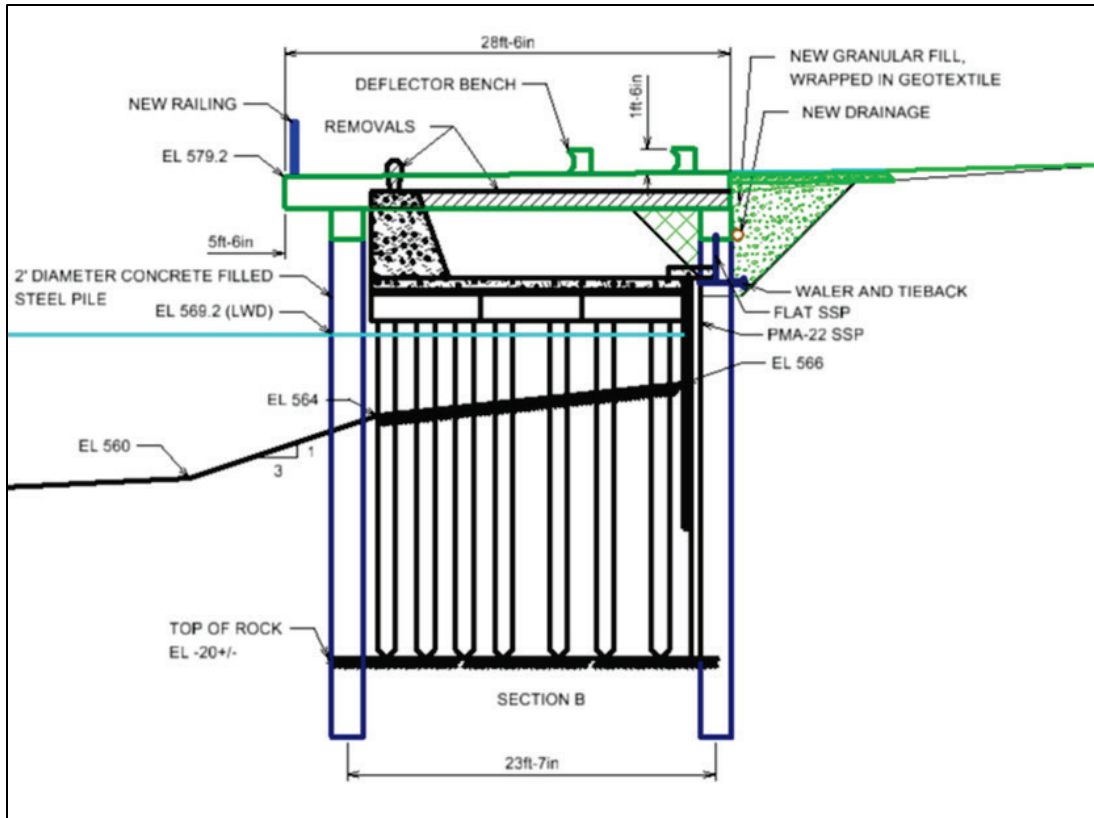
Front view of proposed repair for encased timber pile sections.
